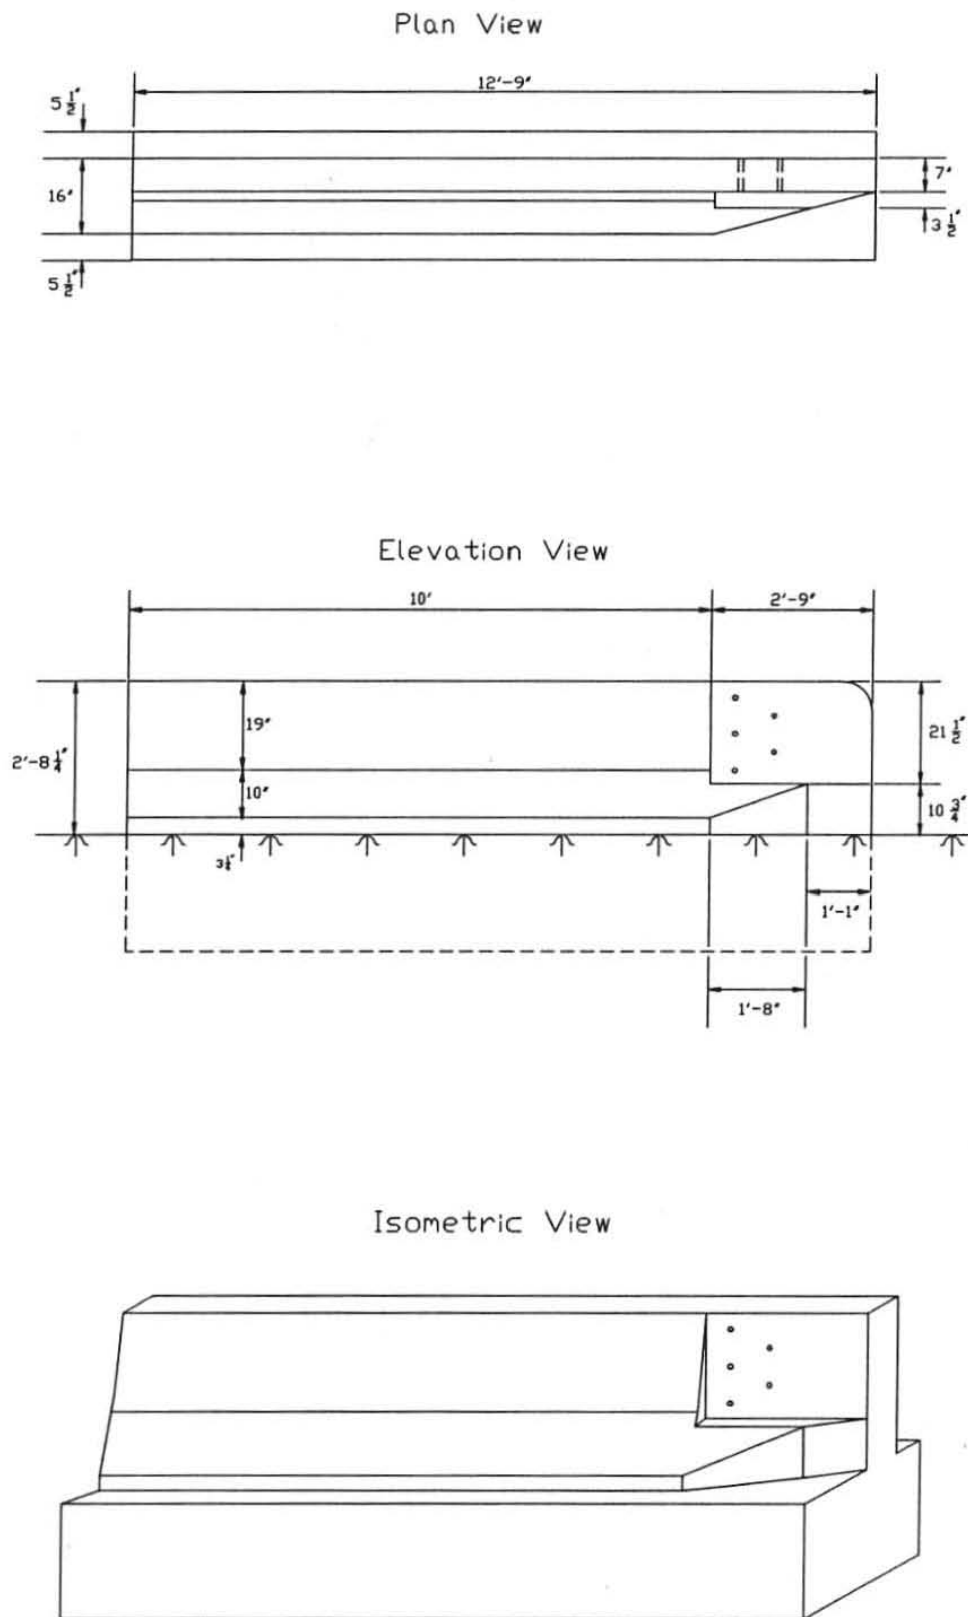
Proposed Front-Face for Modified Barrier Curb End Section
